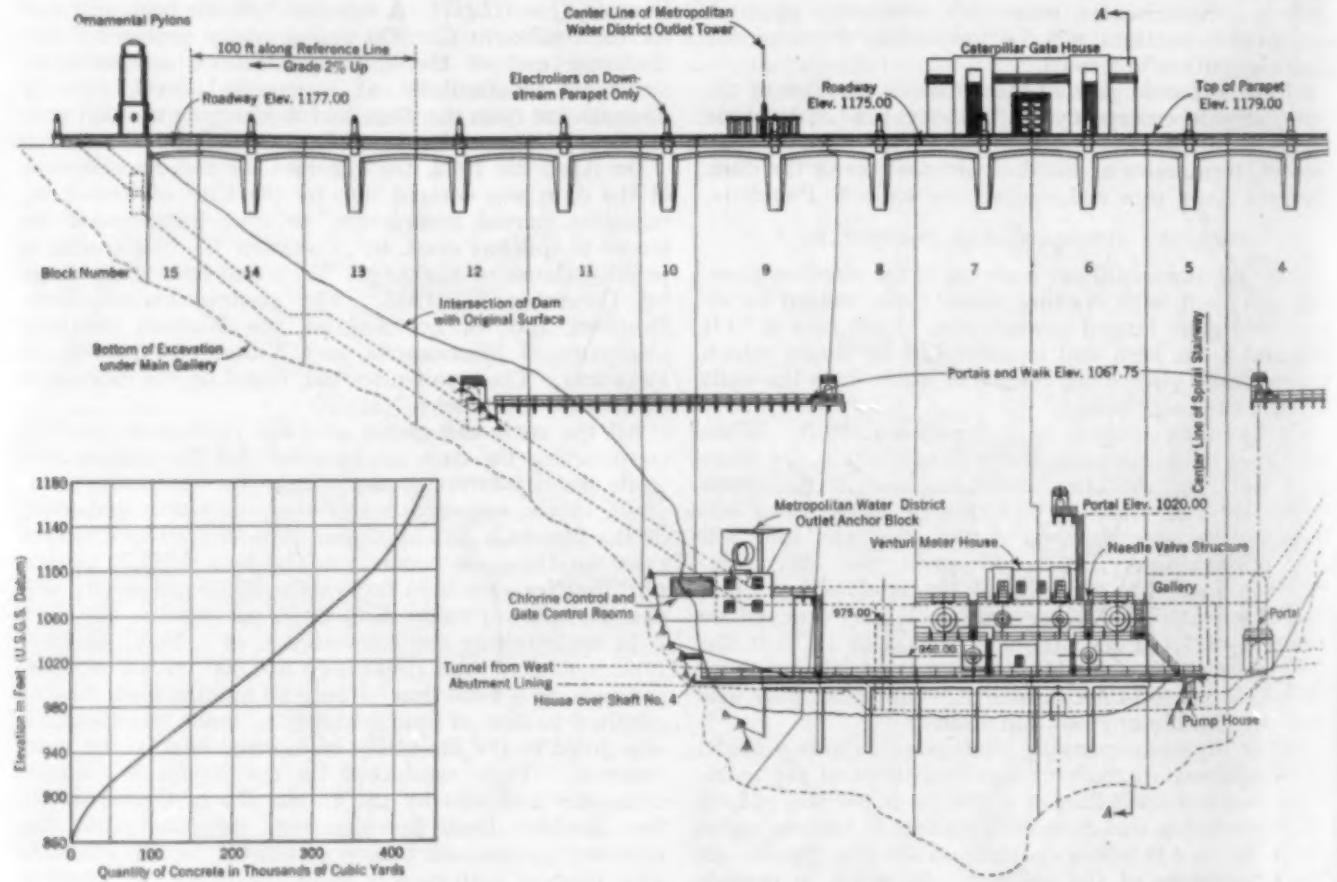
DOWNSTREAM ELEVATION OF DAM
